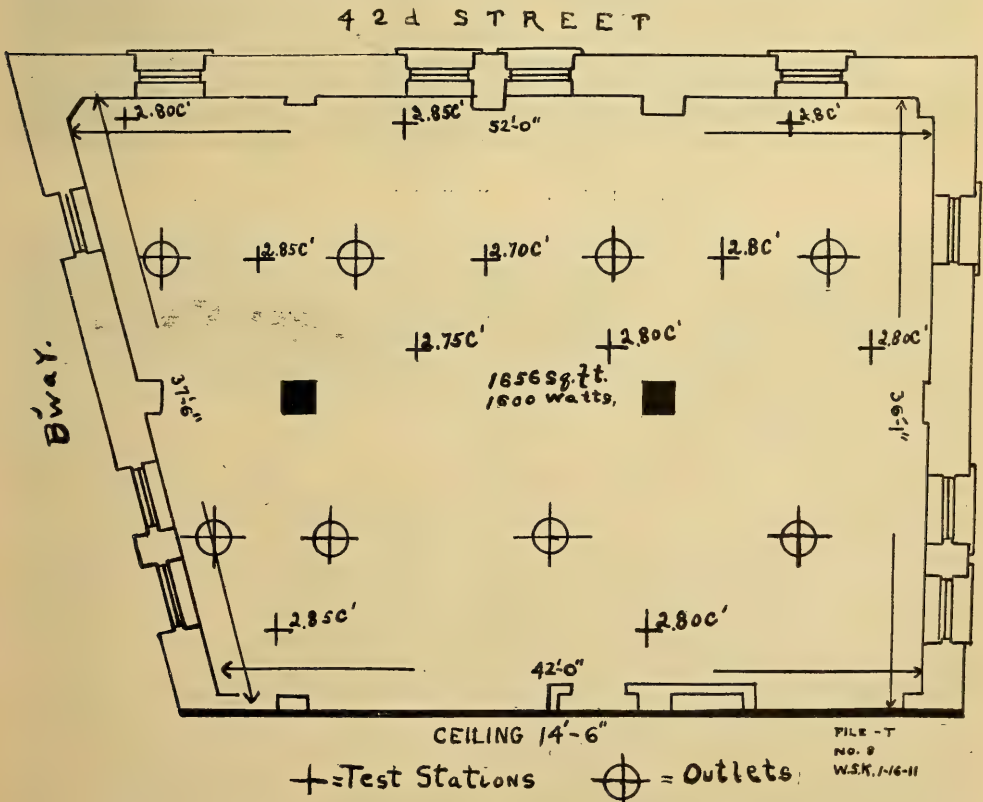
FLOOR PLAN OF OFFICE, SHOWING UNITS AND TEST STATIONS.
